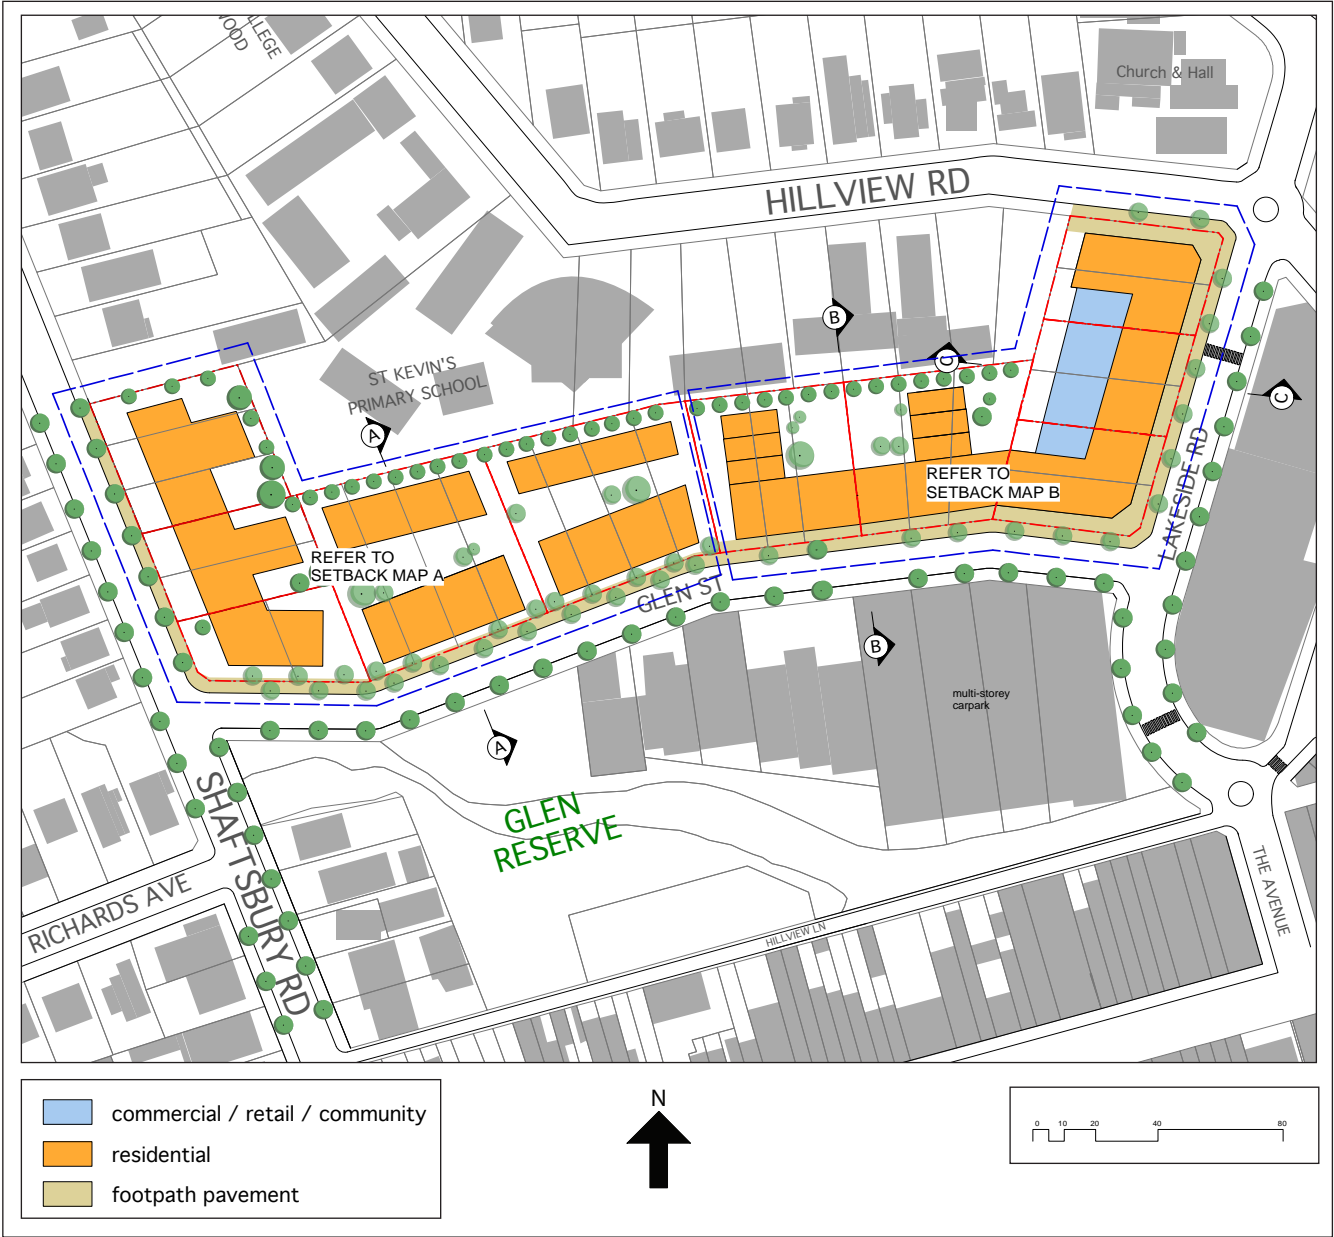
Glen Street and Lakeside Road Precinct Setback Control Plan.
